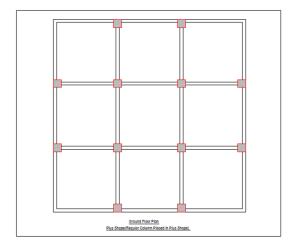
Ground floor plan of Plus shape (Regular Columns placed in Plus Shape)
